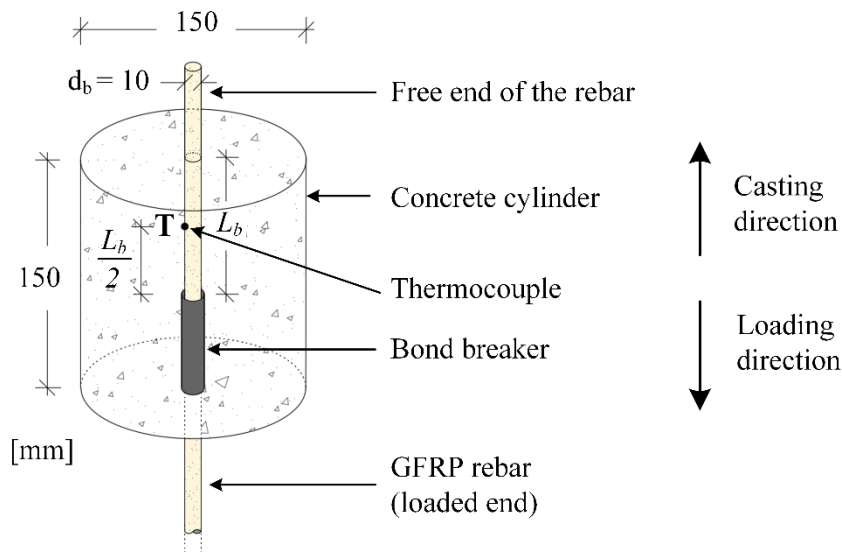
Pull-out test specimen geometry and thermocouples placement.
